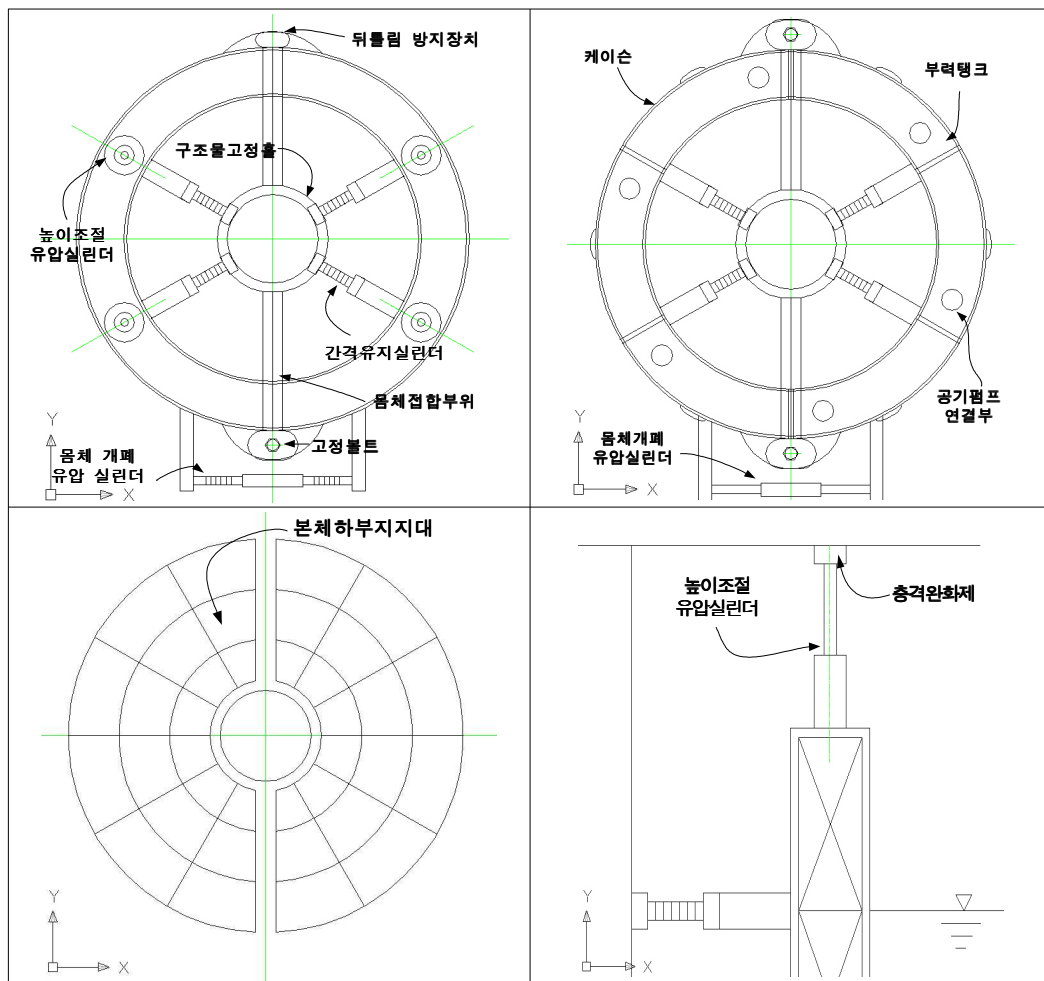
Plan Drawing and Parts Detailed Drawing
